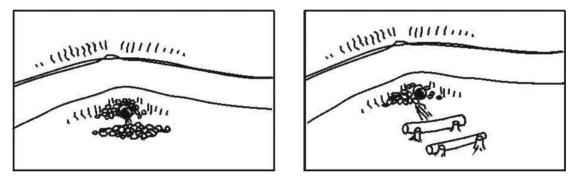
protection works (riprap, logs, rocks, etc.) should be used on highly erodible terrain to limit erosion at culvert point of exit (Source Forest Practices Board, Tasmania 2000).
